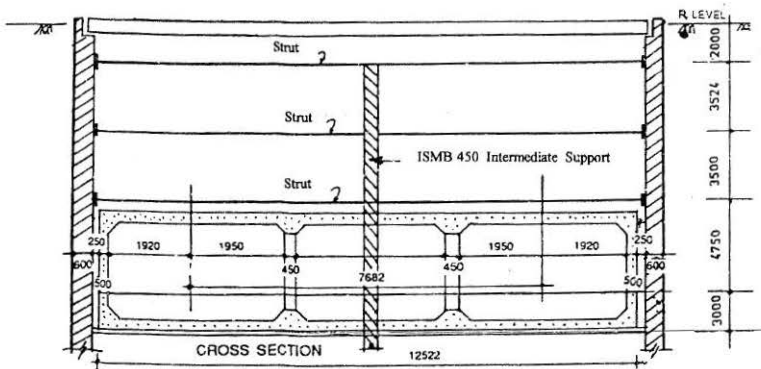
Excavation for Wide Cuts with Intermediate Support
